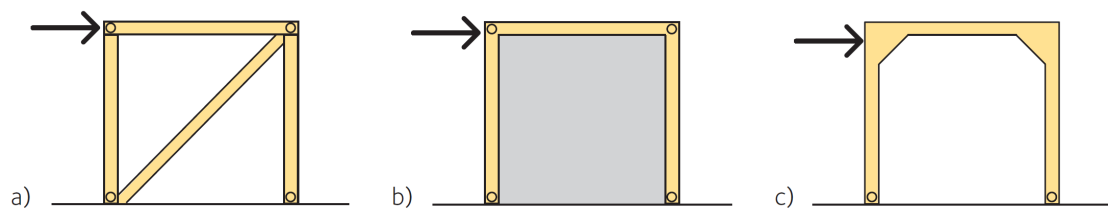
a) Diagonal bracing, b) shear wall, c) rigid joints. (Swedish Wood, 2022a)
